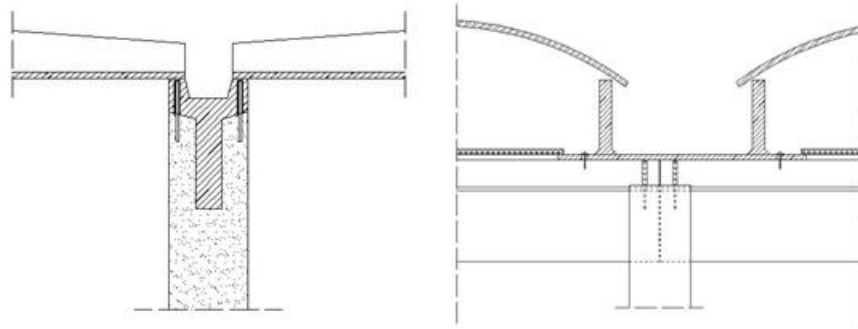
Beam-column connection (left) and covering elements-beam connection (right).
